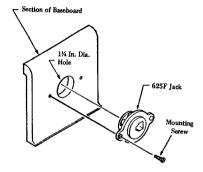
Baseboard Mounted 625F Miniature Jack
